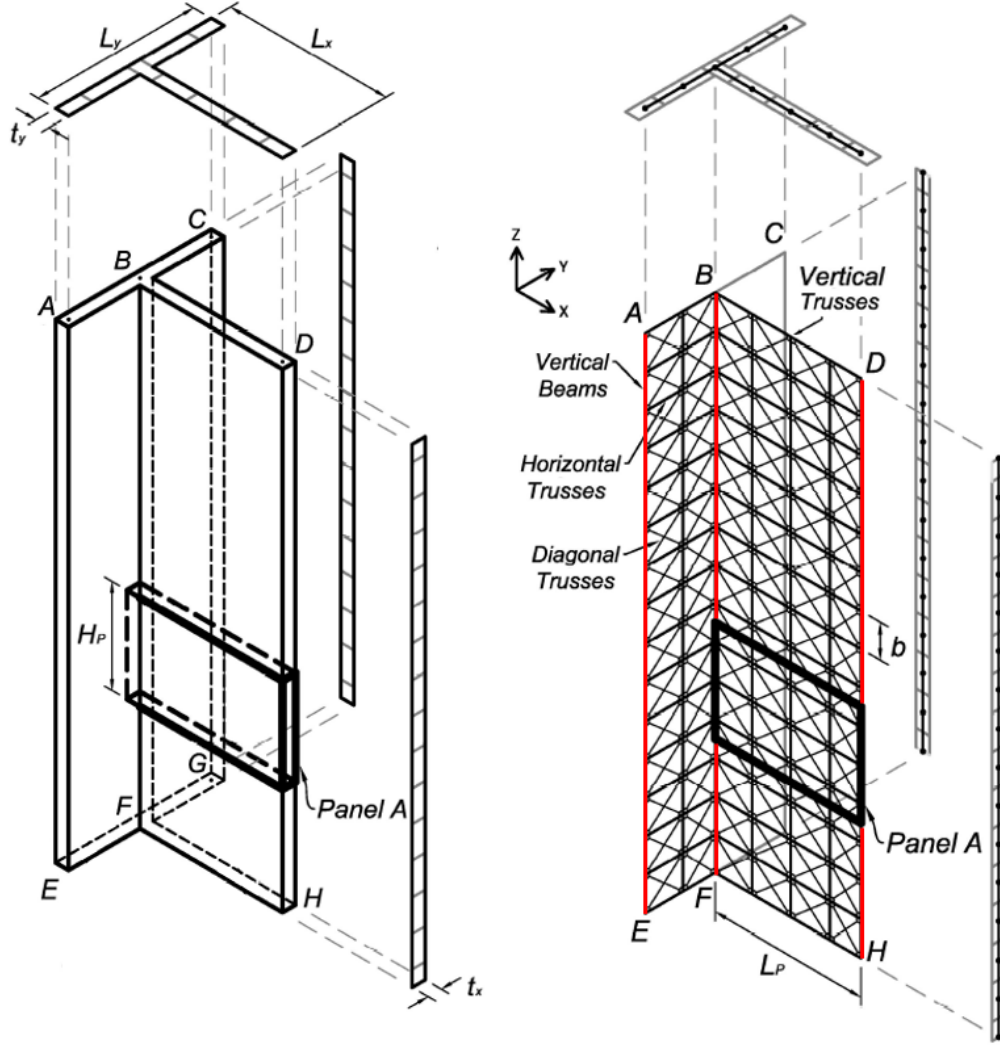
Beam-truss model of a T-shaped wall from [16].
